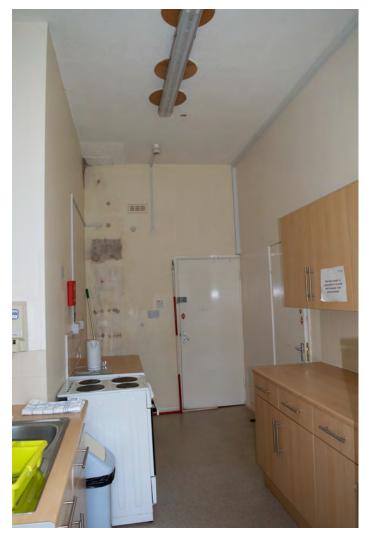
Plate 36: South-east facing shot of kitchen showing exit into ground floor hallway 1 and piano lounge to the right. 1mx2m scale.
